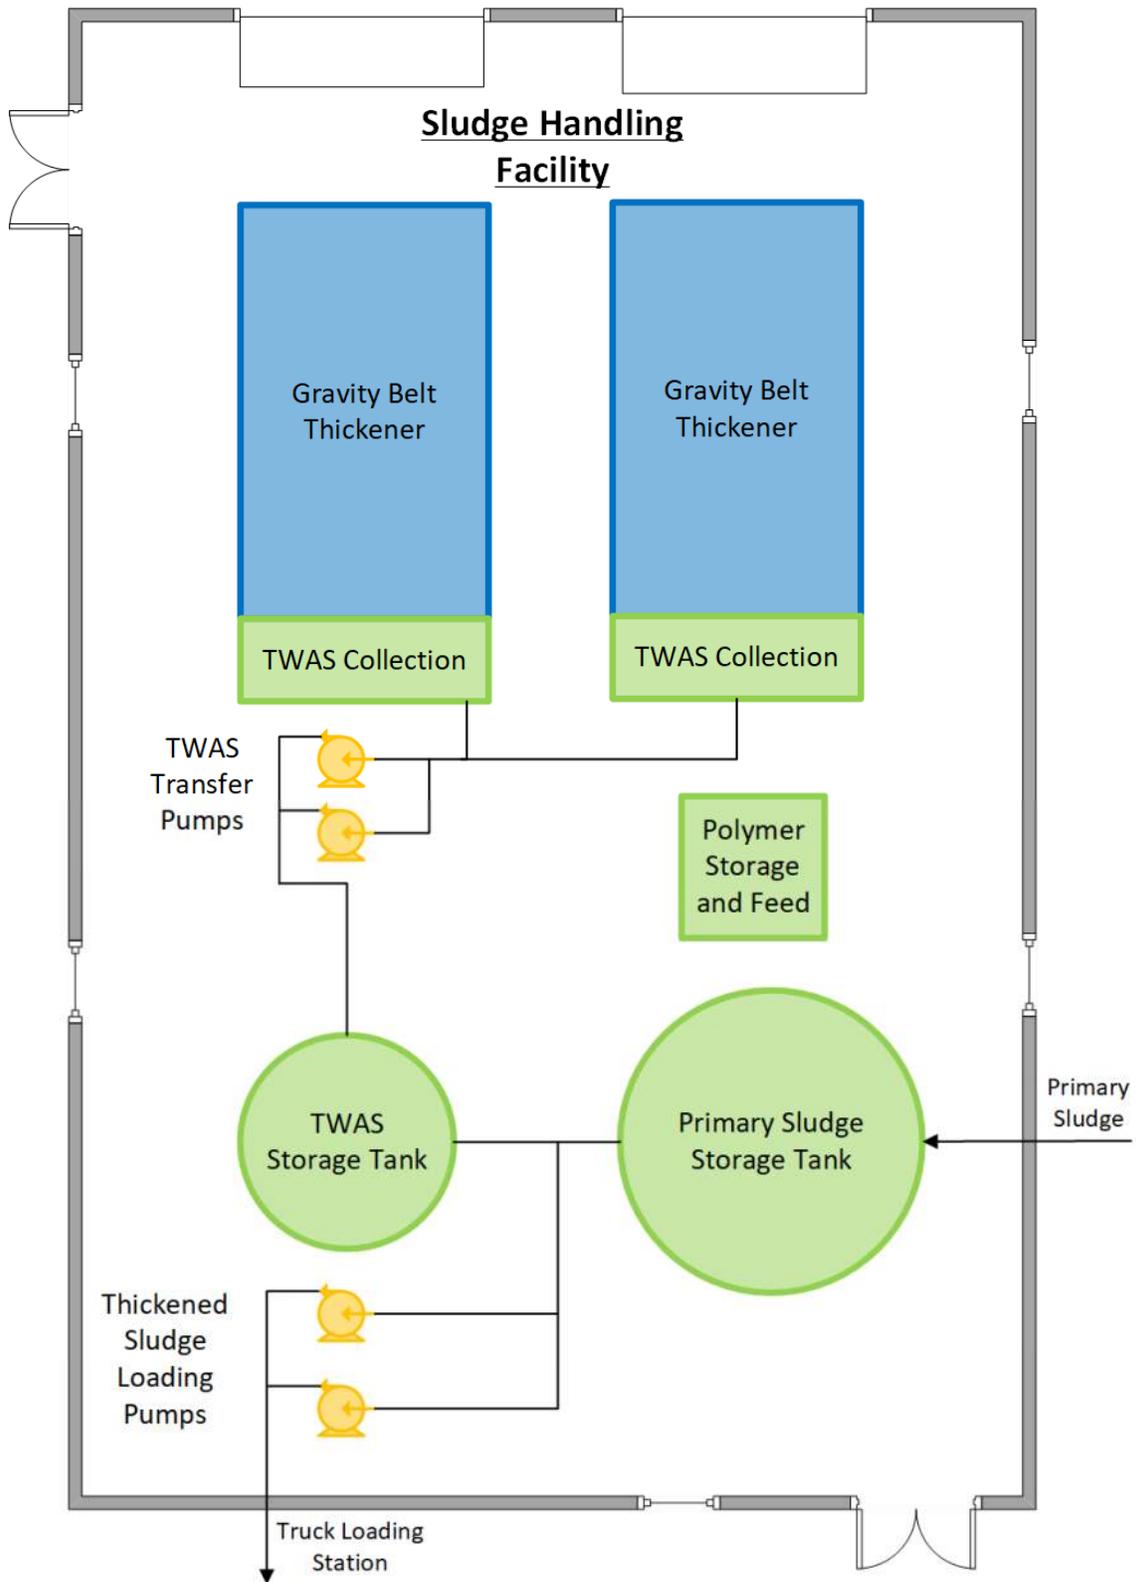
New Sludge Handling Facility for Derby and Ansonia Plants
